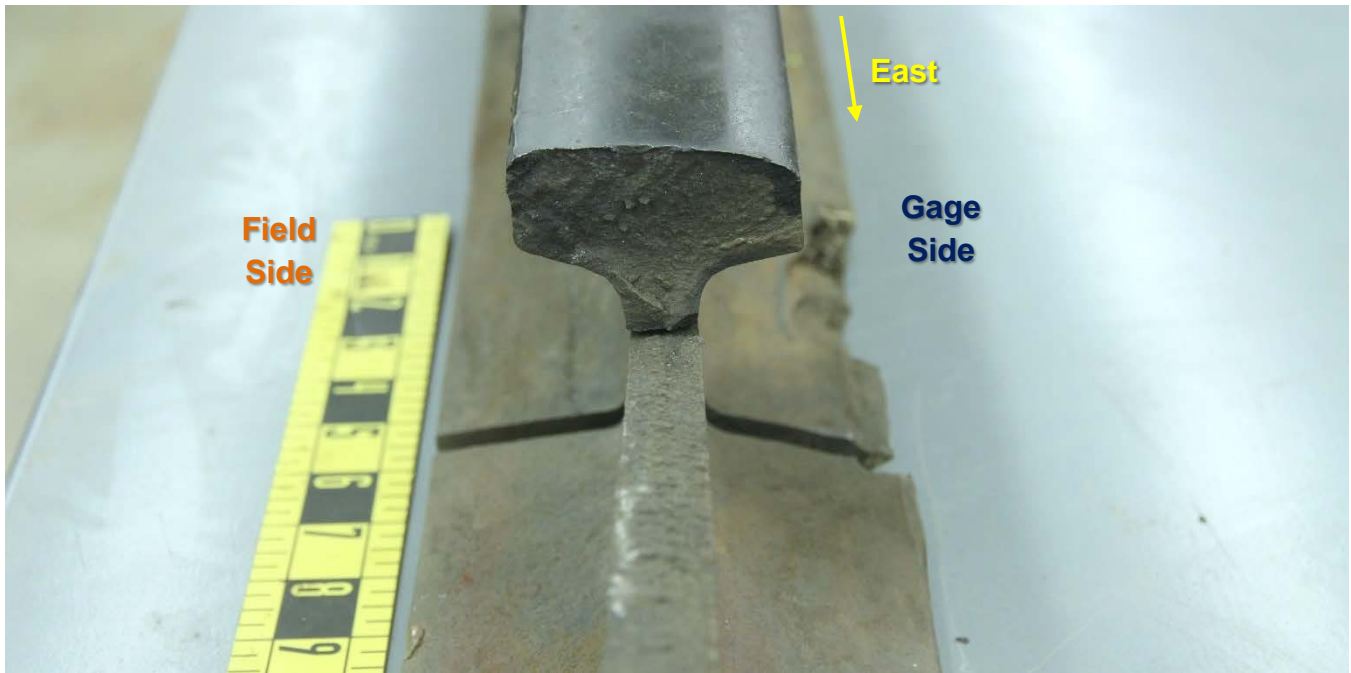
The mating fractures of the 10N and 11N fragments, viewed facing west.
